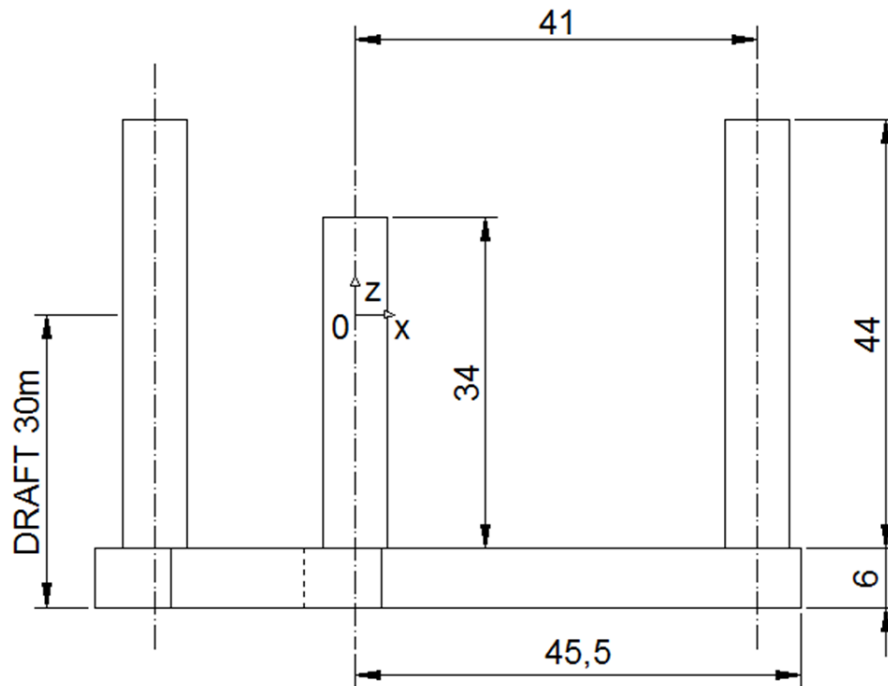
CSC hull dimensions, side view, dimensions in meters [m]
